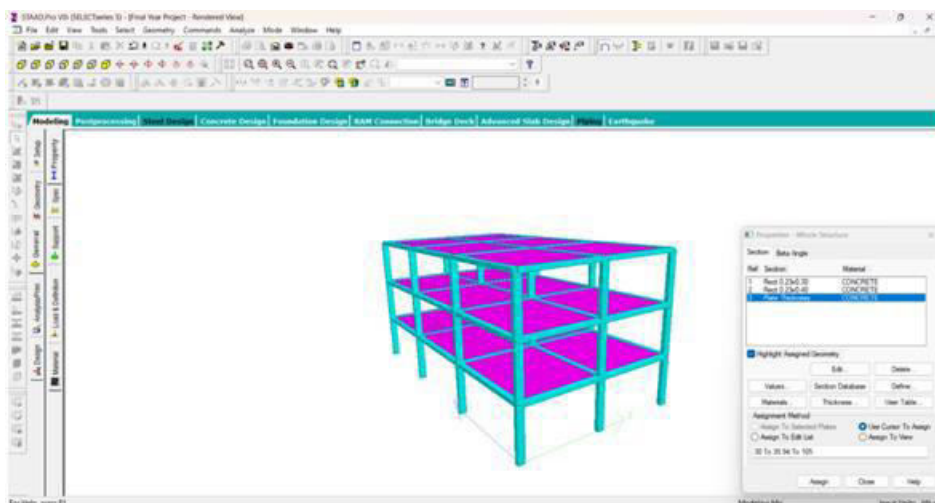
Rendered View of Beams, Columns, Slabs of Residential Building with Plate mesh
